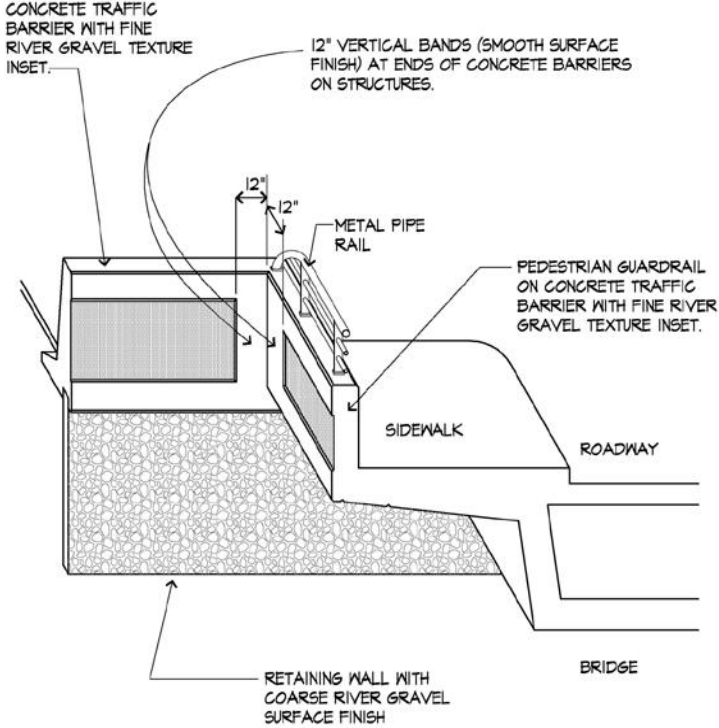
SR 509 Corridor Finishes on Bridge Traffic Barrier Abutting a Wall.
